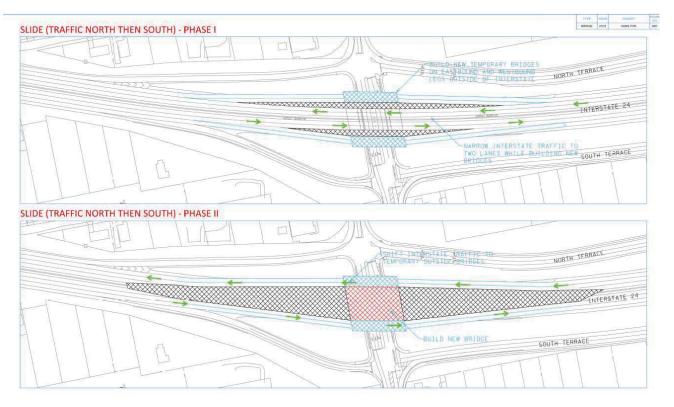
Traffic Control Plan for the I-24 Bridge over Germantown Road Slide (Traffic North Then South) Option
